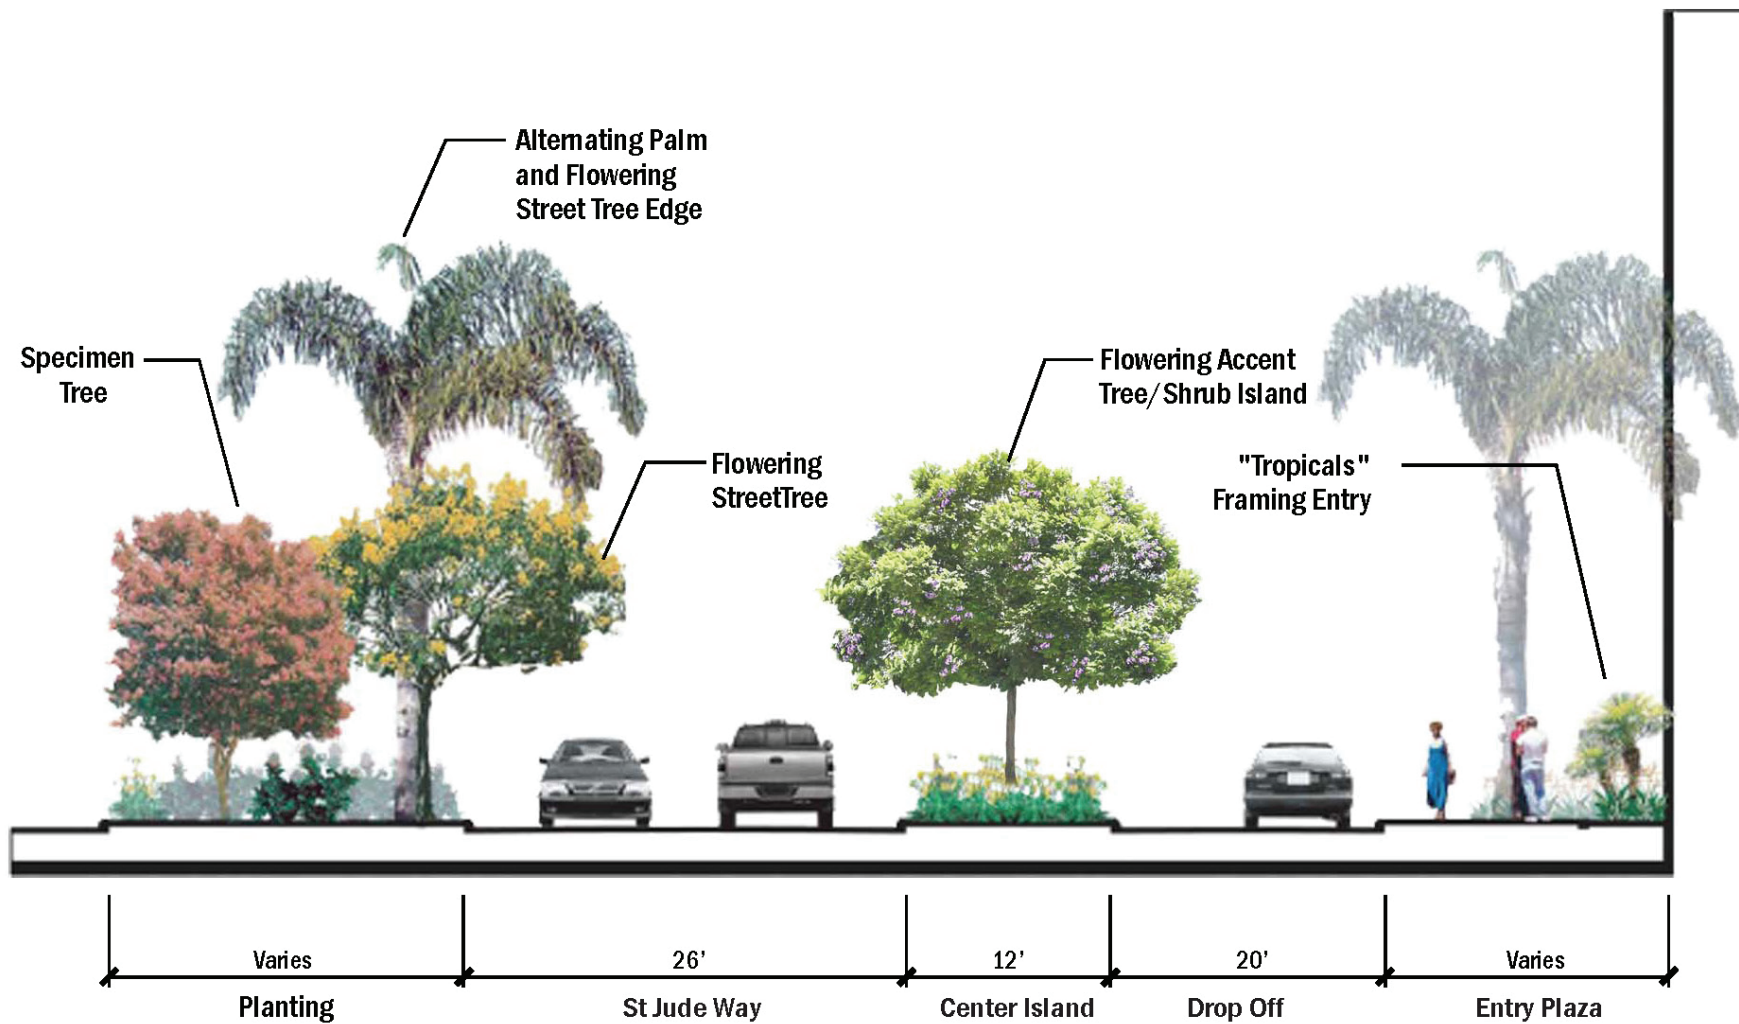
, Main Entry Plaza at St. Jude Way
